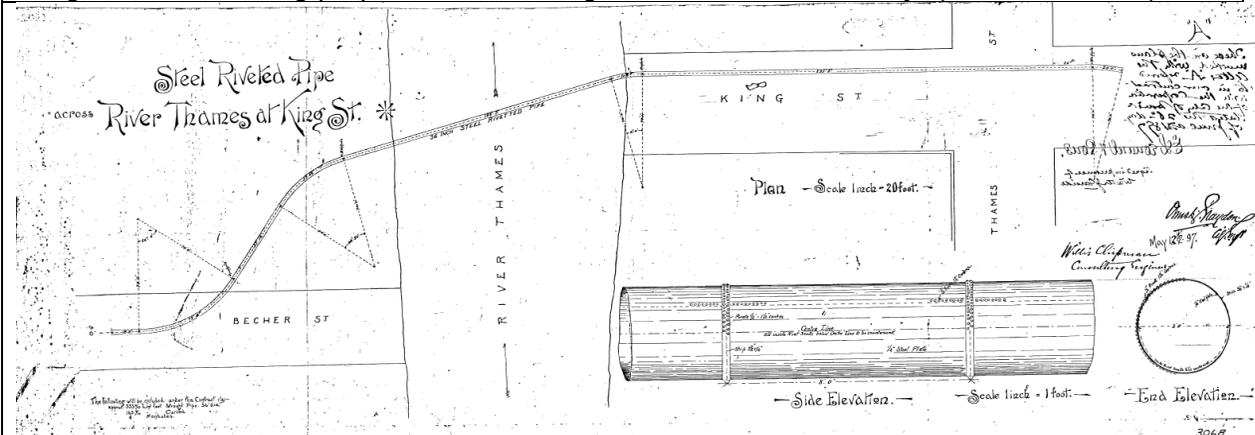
"Detail of steel riveted pipe across River Thames at King Street" (May 12, 1897)
